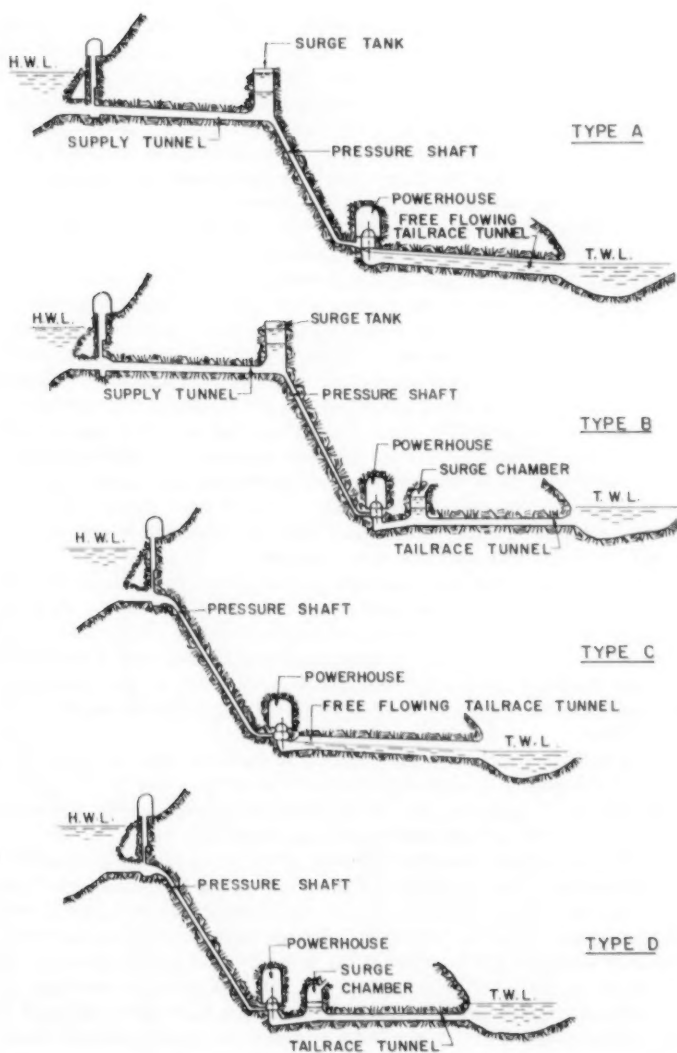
TYPICAL SCHEMES OF UNDERGROUND DEVELOPMENT
